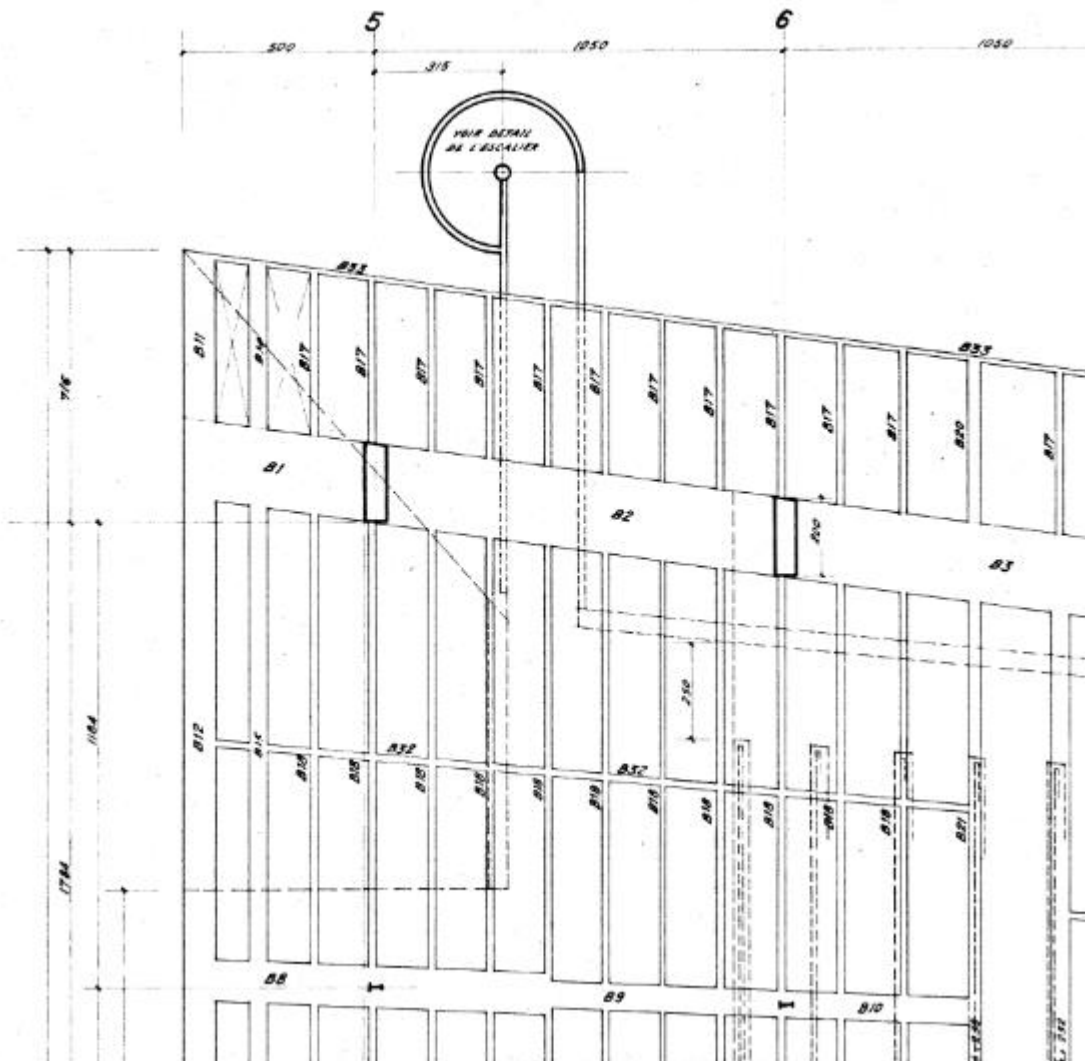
OAT upper-level concrete framing plan from the original drawings in area of collapsed soffit (Darr el Handasah Consulting Engineers, C308, Revision 4, 1969)
